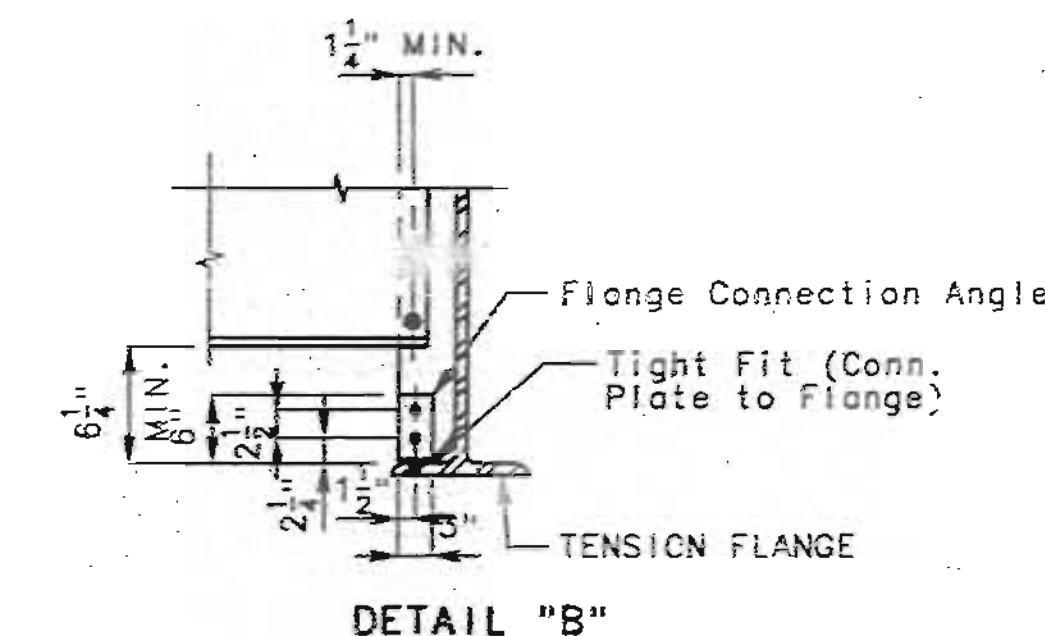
X20.7 & C 7X9.8 CONNECTIONS NEAR PIERS NO. 4 & 7
